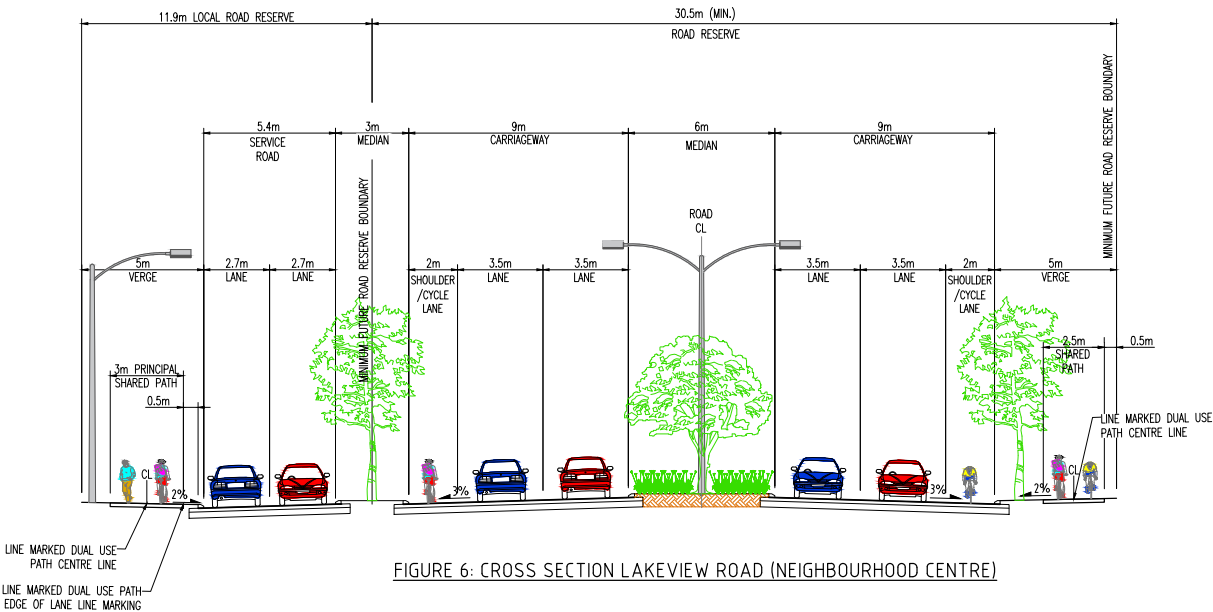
CROSS SECTION LAKEVIEW ROAD (NEIGHBOURHOOD CENTRE)
